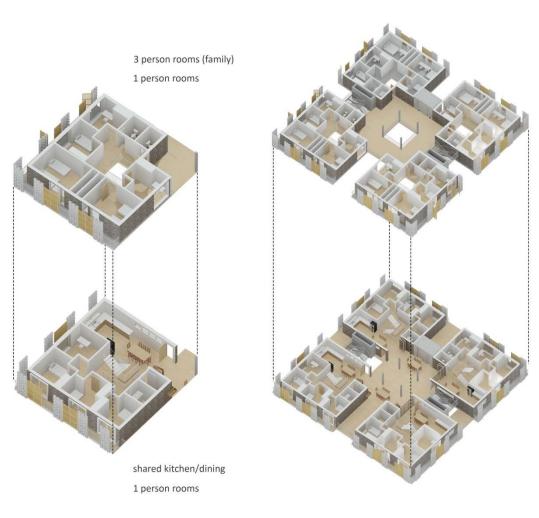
Transitional housing node: Typical floor plan. (Third and fifth floor plan).
